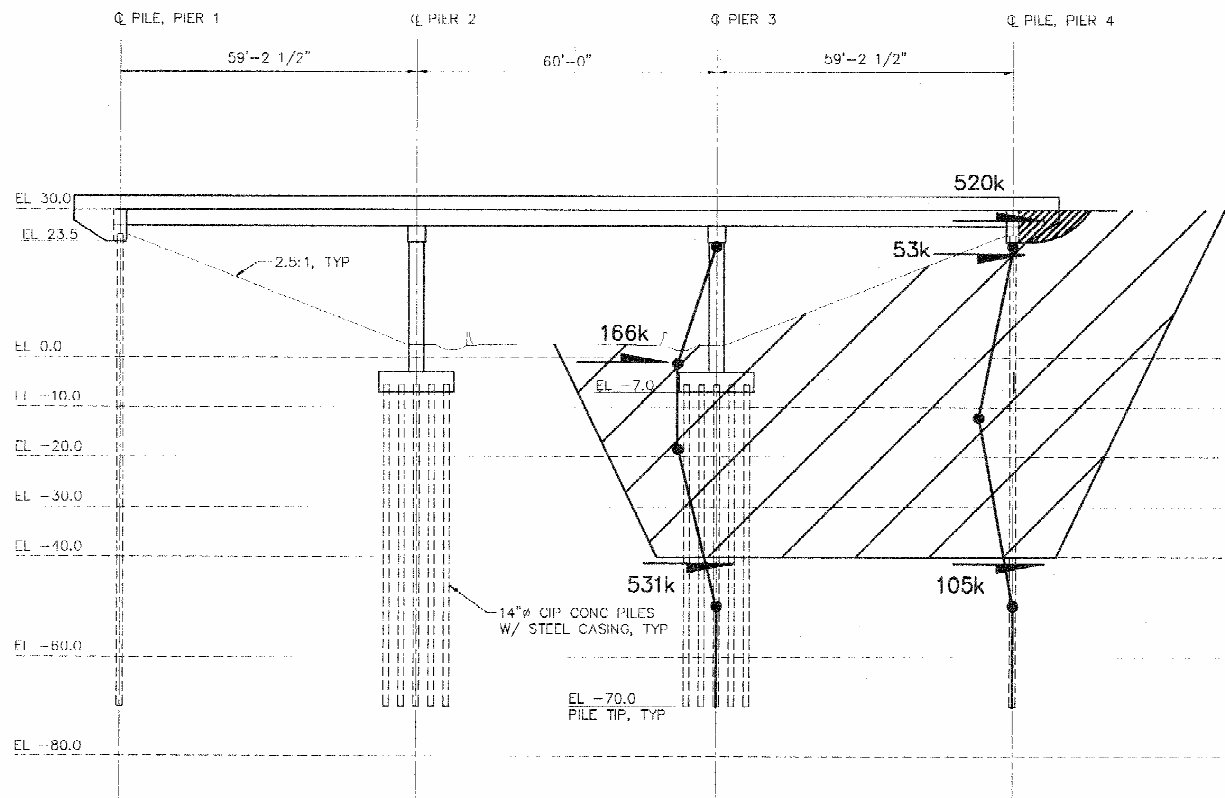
Piers 3 and 4 Structural Forces Resisting Lateral Spreading
